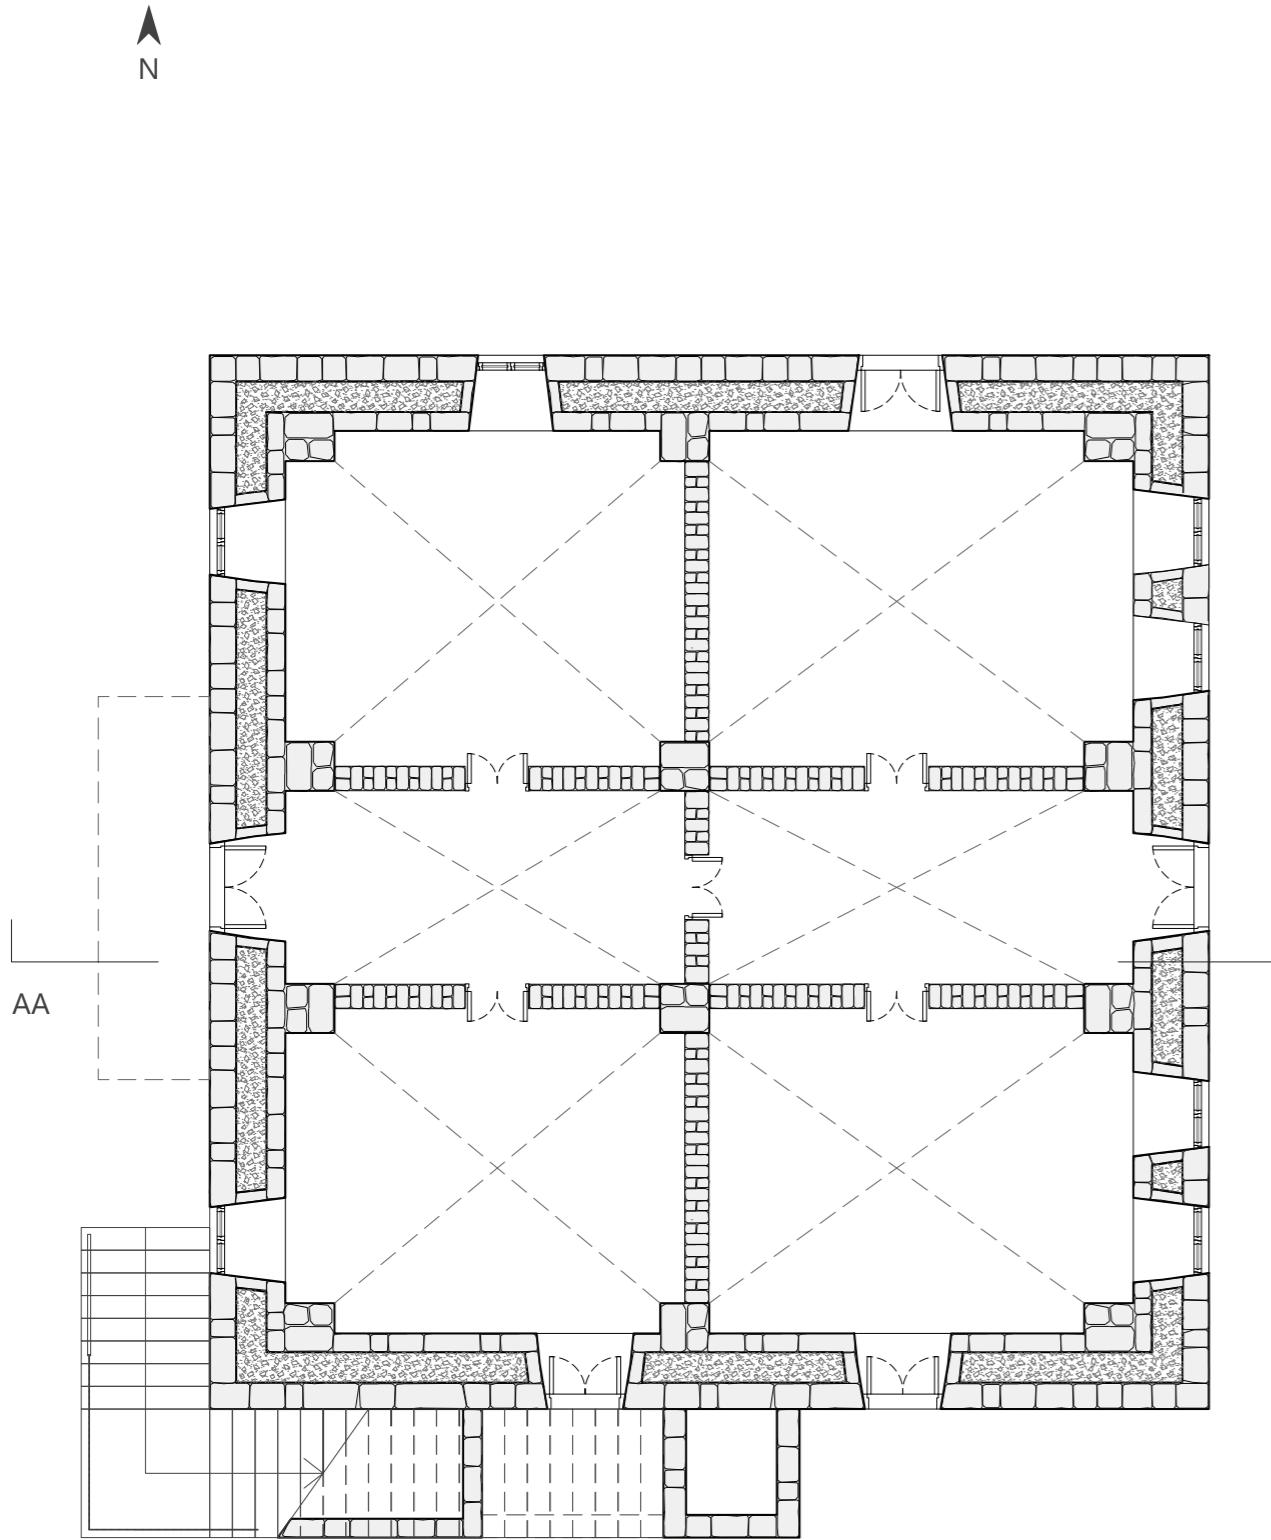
First Floor Plan, scale 1/100
